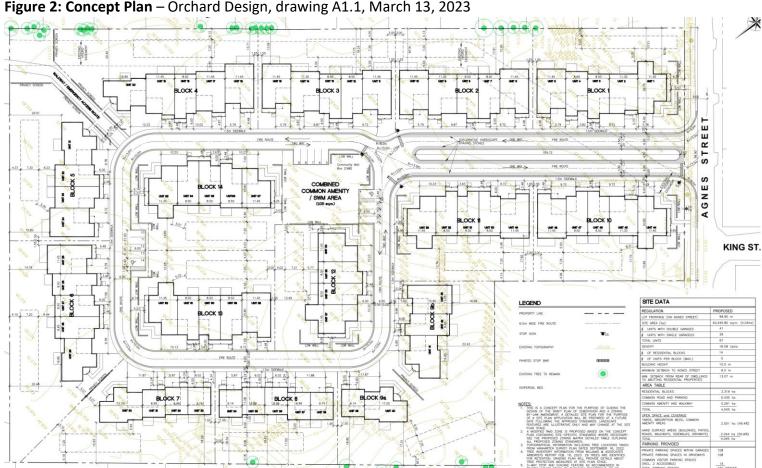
Concept Plan – Orchard Design, drawing A1.1, March 13, 2023
